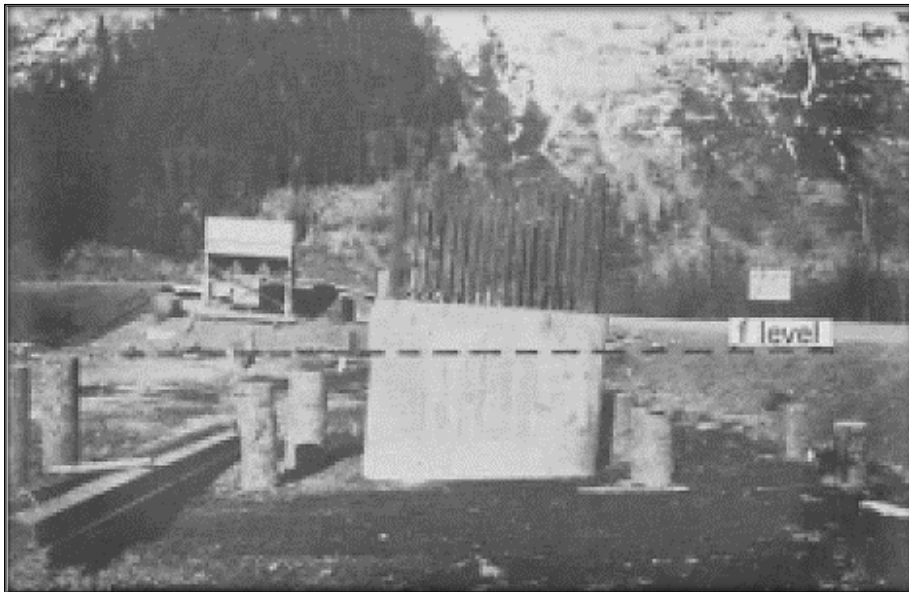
Tilt (15°) of the Foundations of the Snow River Bridge 605A due to Liquefaction, (Dickenson, Barkau & Wavra, 2002)
